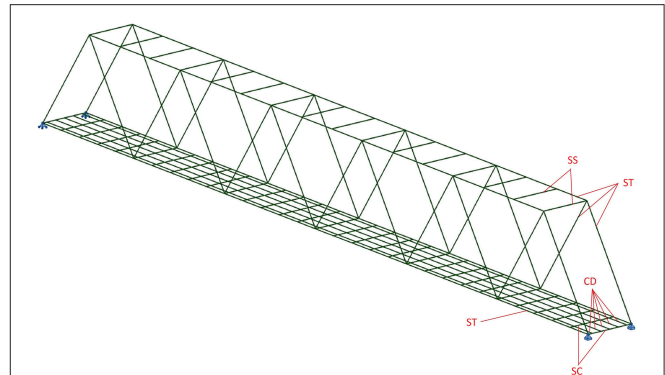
| Geometry of the numerical model of the bridge, marked the elements of bridge structure modeled with a 1-D beam elements: ST-element of steel truss, SS-steel strut beam, SC-steel cross beam, CD-element of reinforced concrete deck; (Olaszek et al., 2013) permission was granted by Waldemar Szaniec (author of the model).
